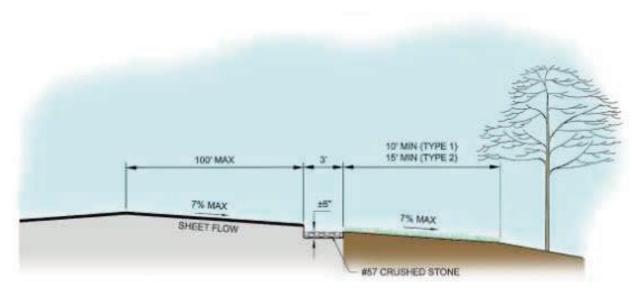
Schematic Cross Section of a Disconnected Paved Area (Source: NCDENR, 2014).
